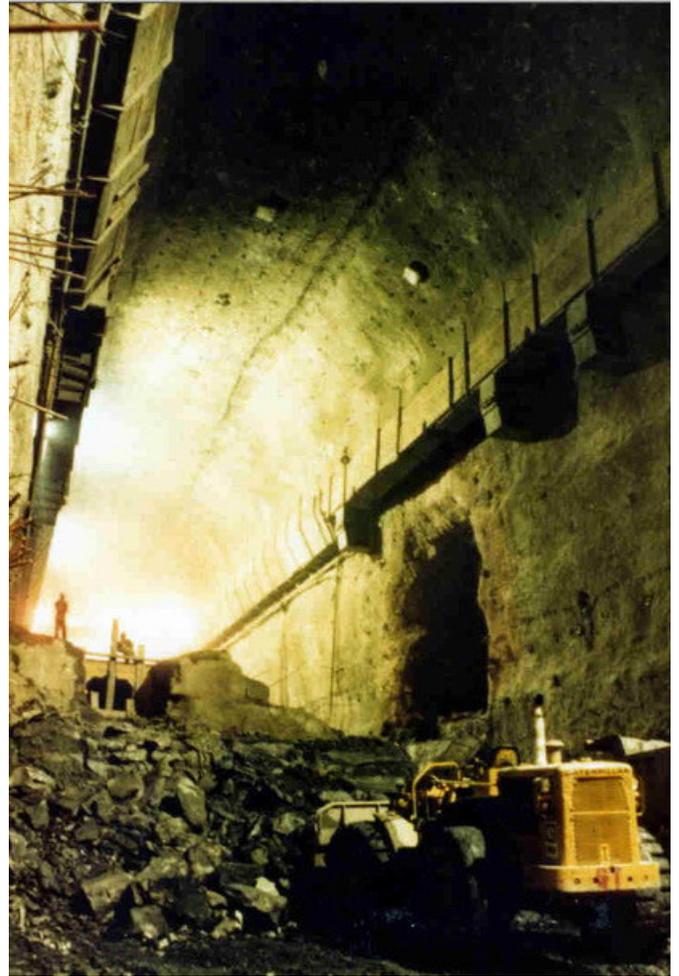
The 17 m span, 32 m high underground powerhouse of the Drakensberg Pumped Storage in South Africa. This cavern was excavated in the undisturbed sedimentary rock mass illustrated in Figure 6 and it was supported using rockbolts and shotcrete only. A 5 cm thick layer was applied immediately to all exposed rock surfaces and this was followed later by a layer of wire mesh and an additional 10 cm of shotcrete. The project has recently completed 25 years of trouble-free operation. Note: The extreme degradation of the Drakensberg rocks was partly because some of the units were tuffaceous
